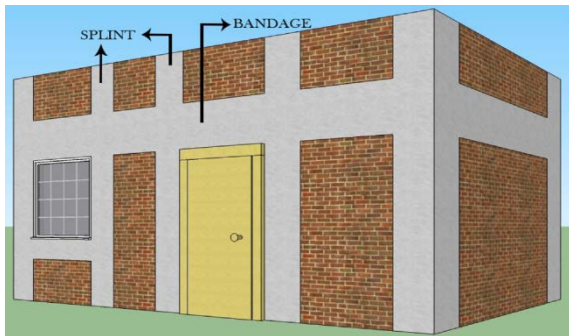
Retrofitting of a masonry building using Ferro-cement splints and bandage [1]
